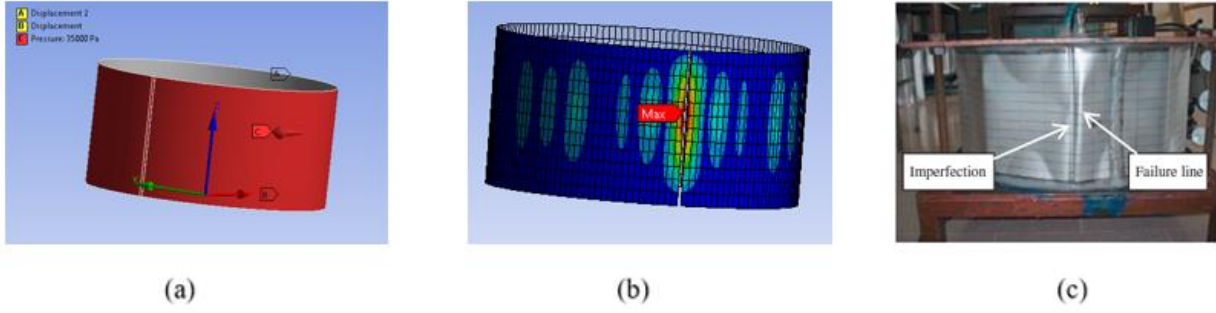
SCS8 (a) Geometry with Loading (b) FE failure shape (c) Test image at failure.
